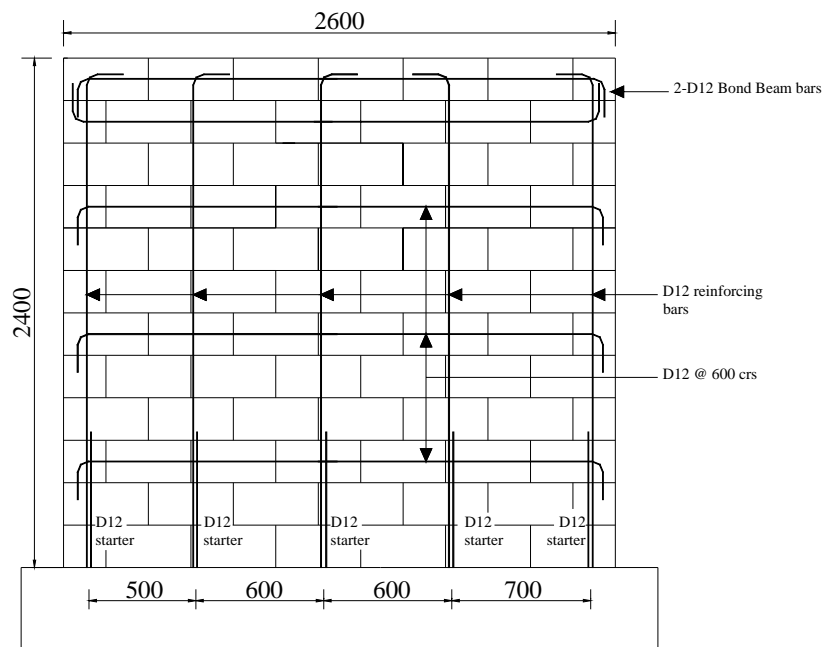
Geometry and reinforcement details of Commercial Wall 2.
